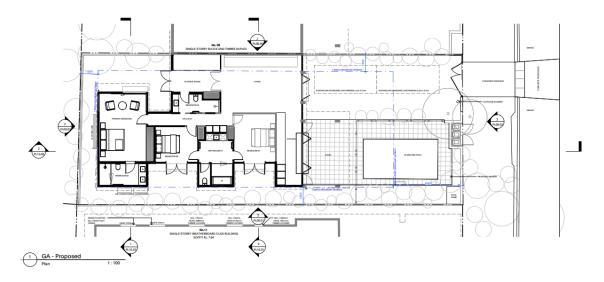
Proposed Ground Floor Plan – Redeveloped Unit 1 (Source: officefora, September 2025)
